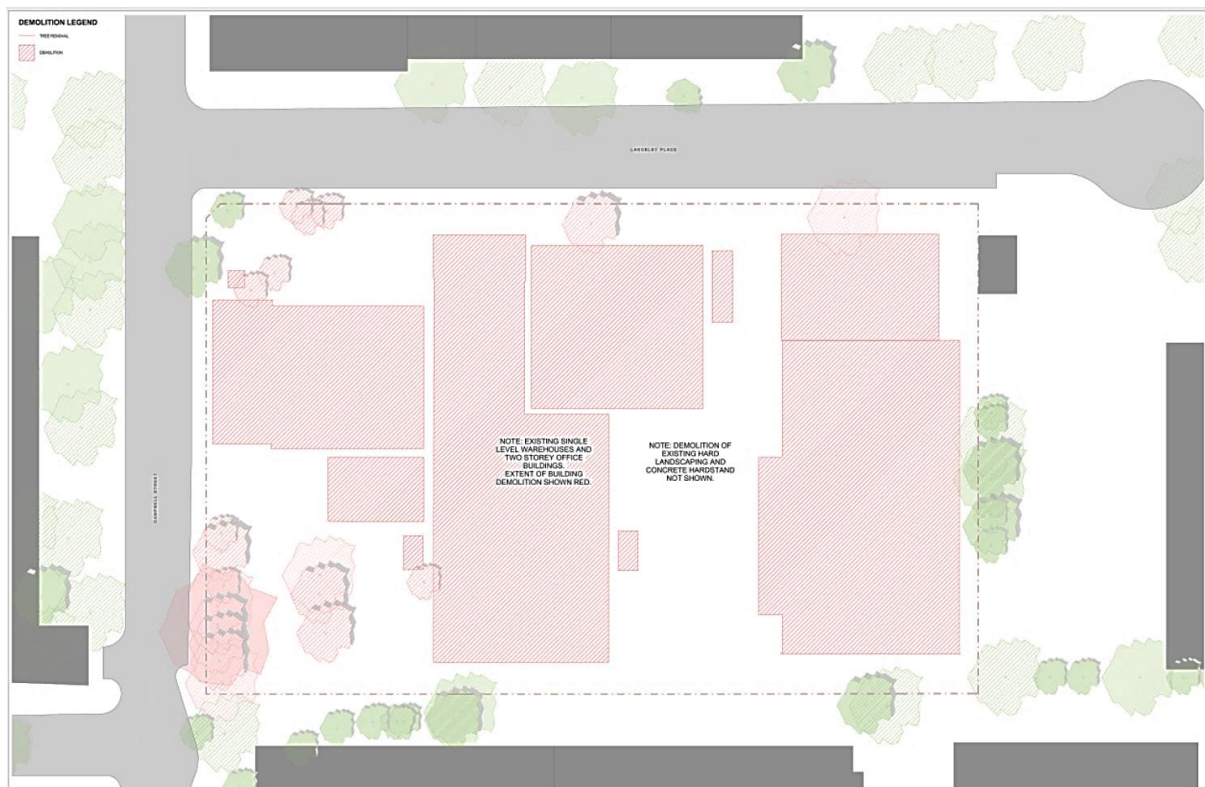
Demolition Plan (source: Demolition Plan in the Architectural Plans prepared by Grimshaw Architects appended to the EIS)
